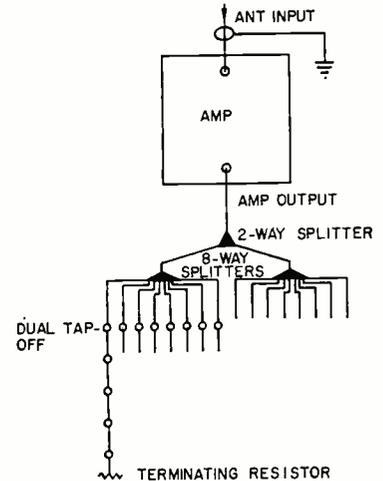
TV/FM system for a five floor apartment building has 80 outlets.
